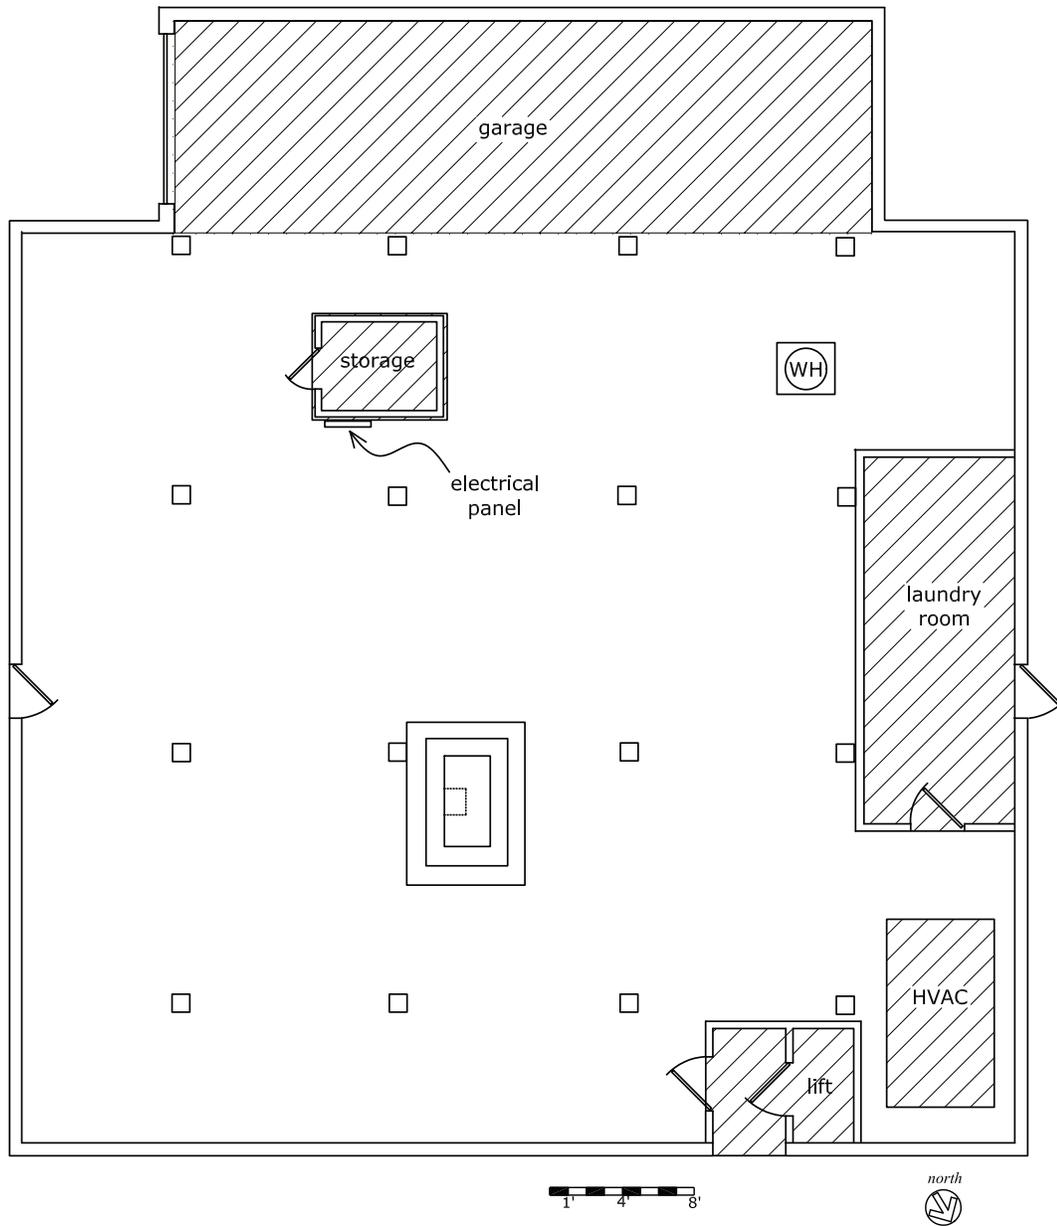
Plan of existing basement. Concrete slab-on-grade is indicated by hatching; remainder of floor is dirt. (T. Jones, NPS-SERO-CR, 2003)
